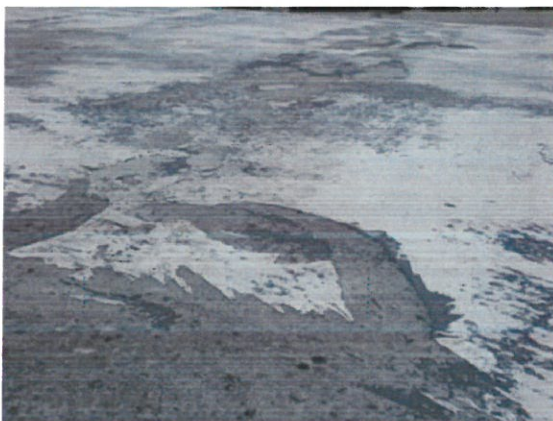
Deteriorated waterproofing coating on roof over ramp on Parking Structure C
